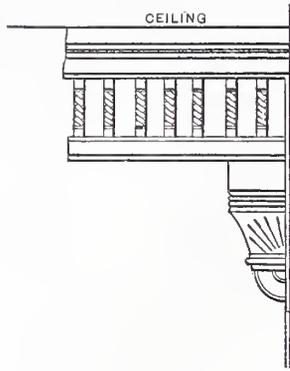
Arch Over Stairs in the First Story Hall.—Scale, 1/2 Inch to the Foot.
